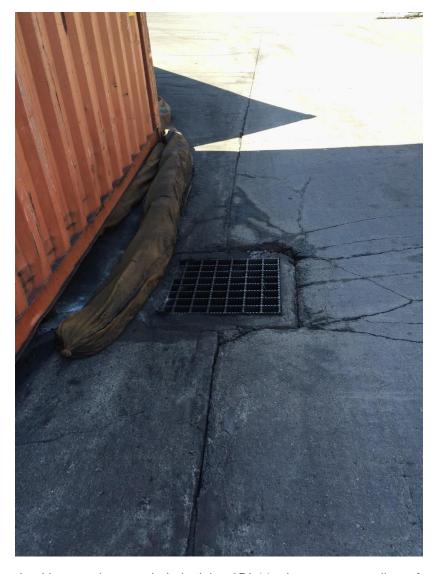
Looking south toward drain inlet 3DI-11 along western alley of secondary storage area: surficial cracking and concrete seam in SW-3 area.
